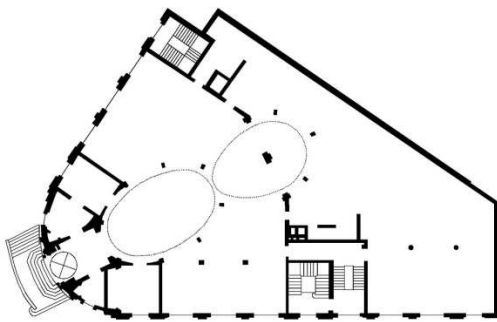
& 15. Ground Floor Plan of the Ziraat Bank (redrawn from Alfieri, 1990: 152) and the central service hall (D.S.Okesli)
